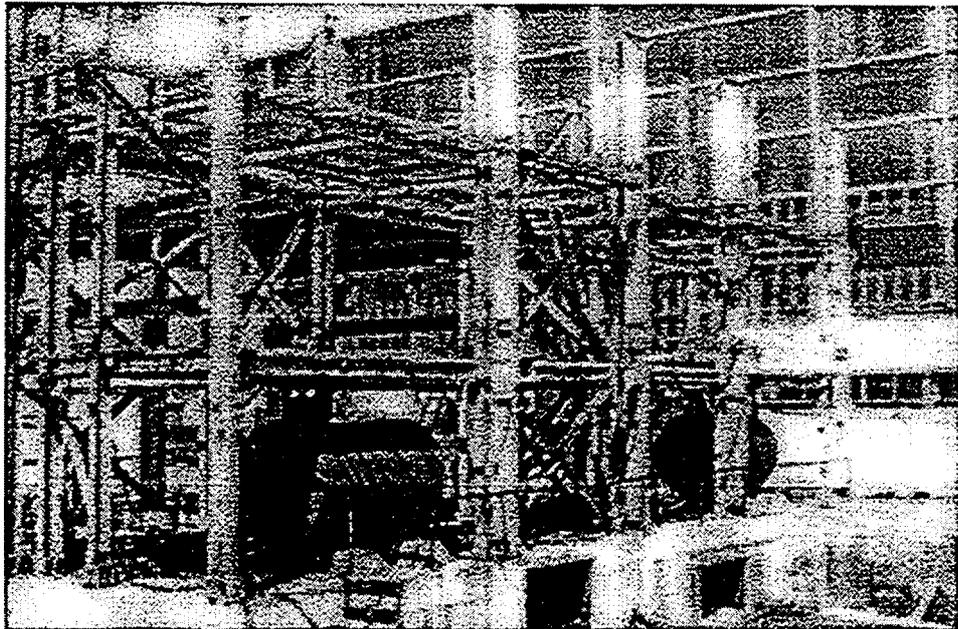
Building of Auxiliary Emergency Feedwater System of Unit 3 /AEFWS-3/ in Construction
